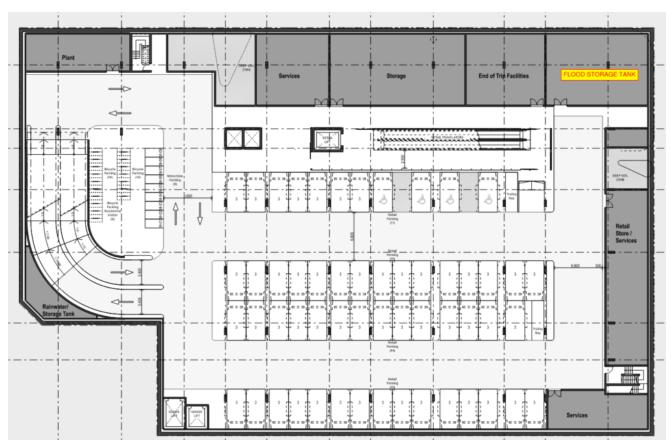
Proposed Location of Flood Storage Tank (Basement Level 1)
